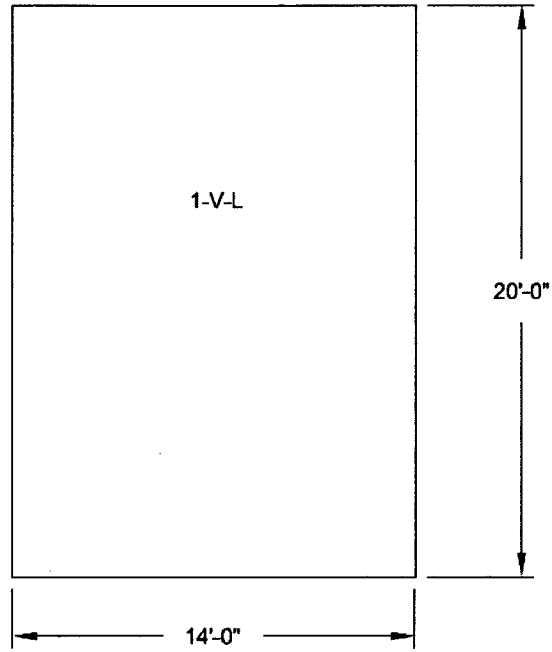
H.6-177 Wall 10 Looking From Outside Horizontal Reinforcement Zones
